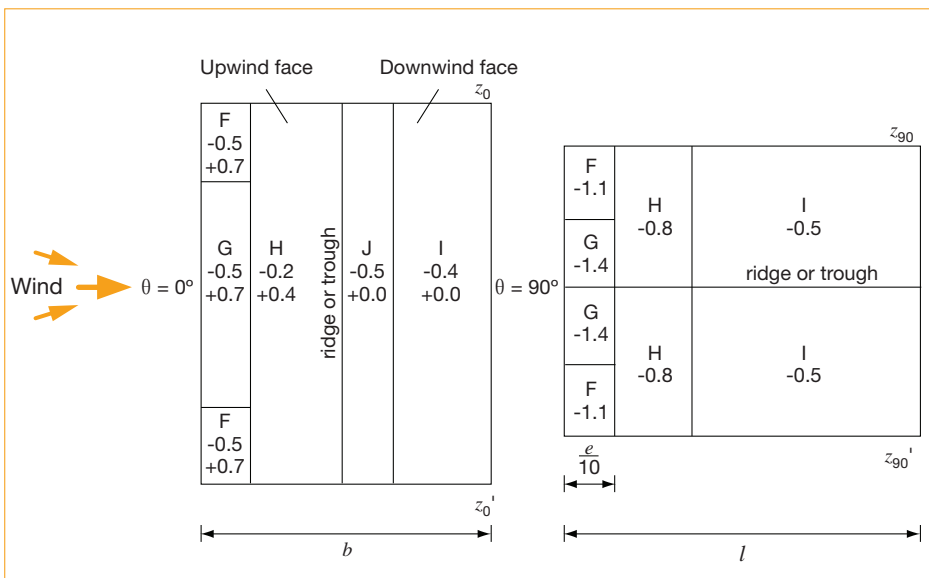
Wind zones on a 30° duopitch gable roof (EC1-1-4 7.2.5)
